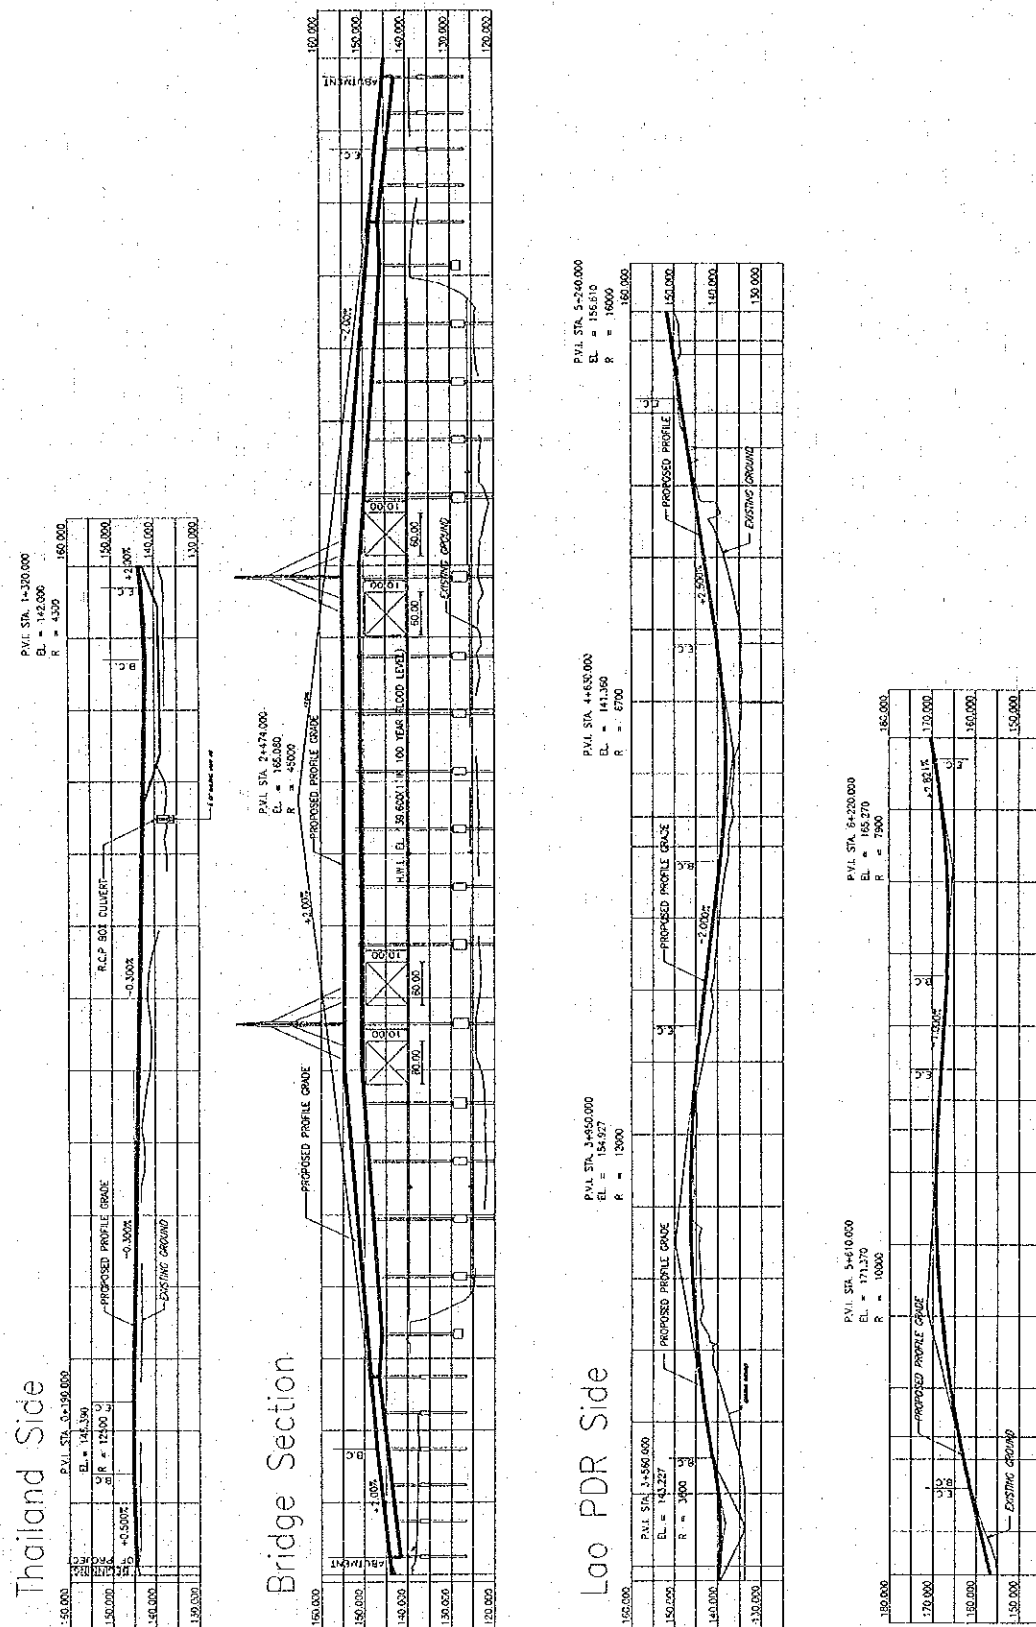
Vertical Alignment of the Bridge and Connecting Roads
